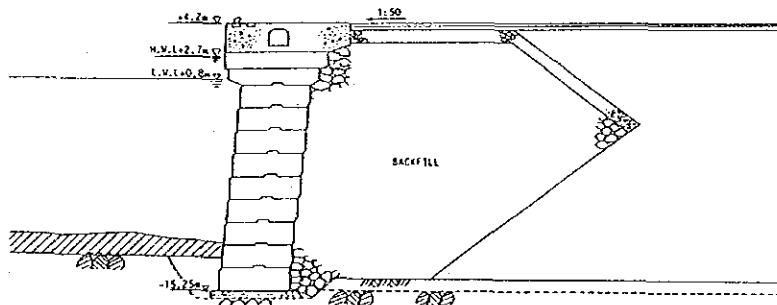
(2) Existing Quay Wall (Berth No.1, No.2)
